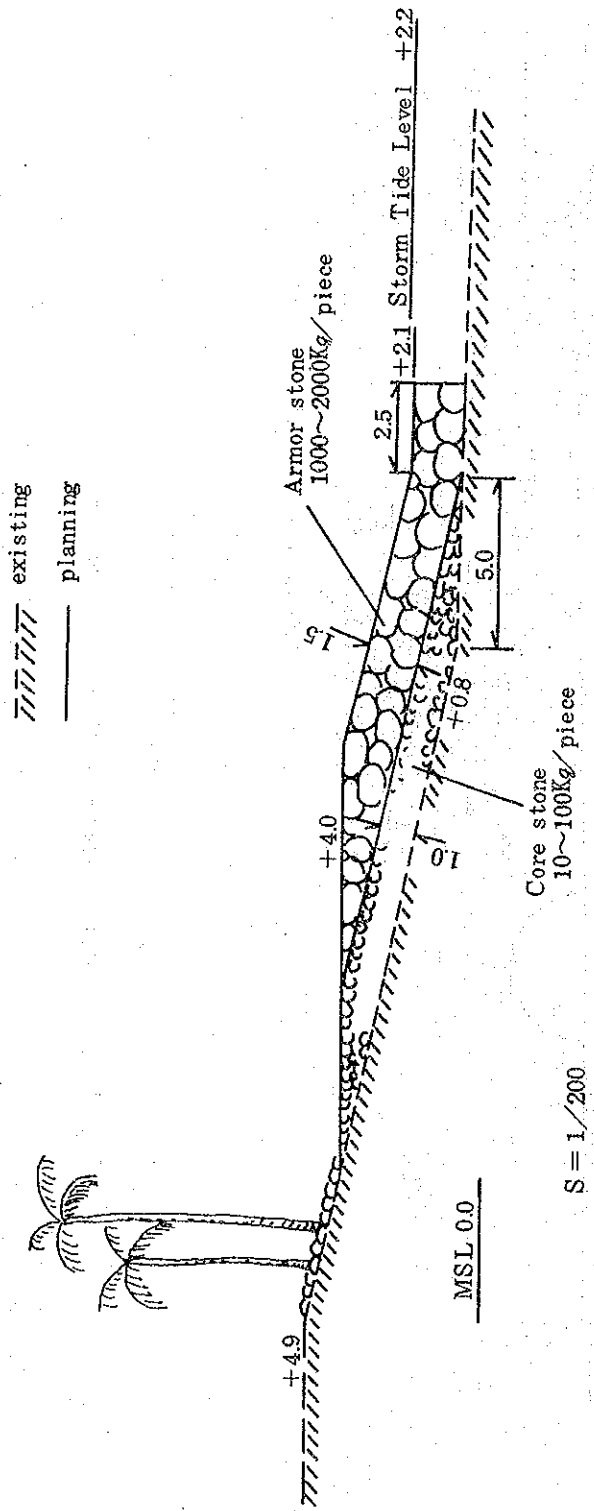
2 Stone parapet profile (b" - b" section)
